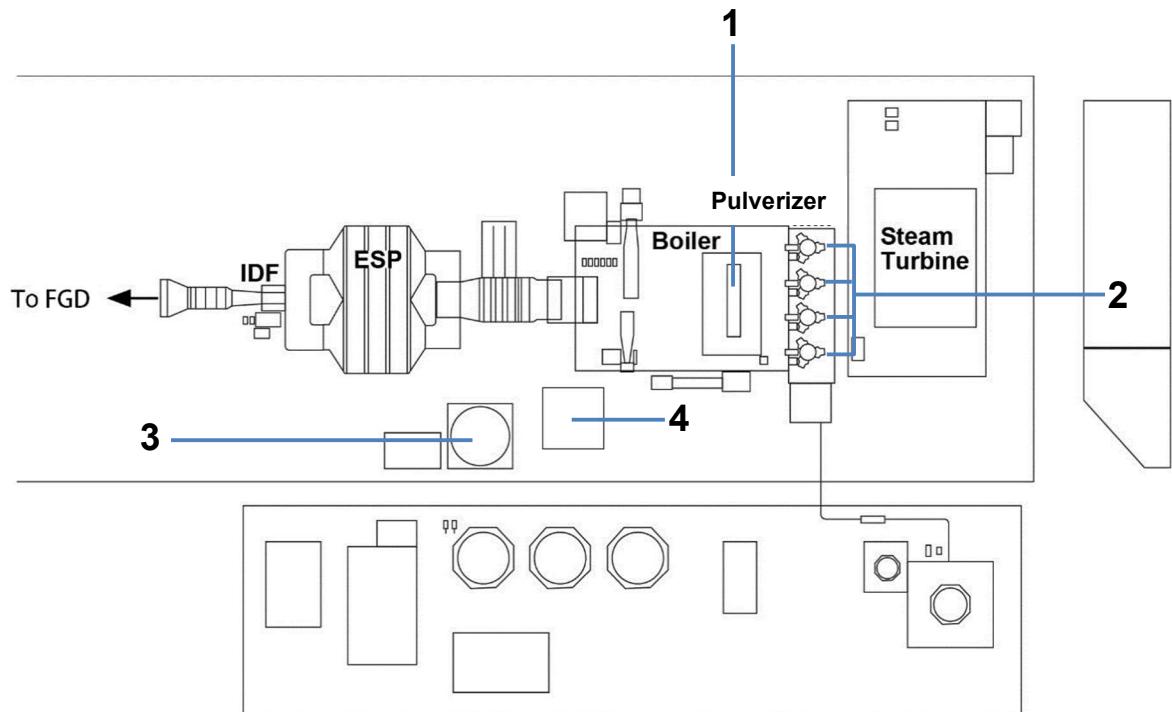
Ash Handling System Arrangement (Typical arrangement example)
